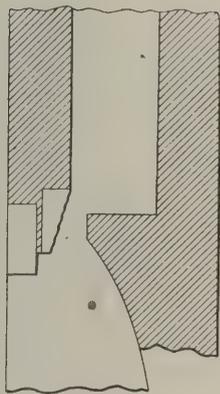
Section Showing Construction when Face of Mantel is More than 4 in.
